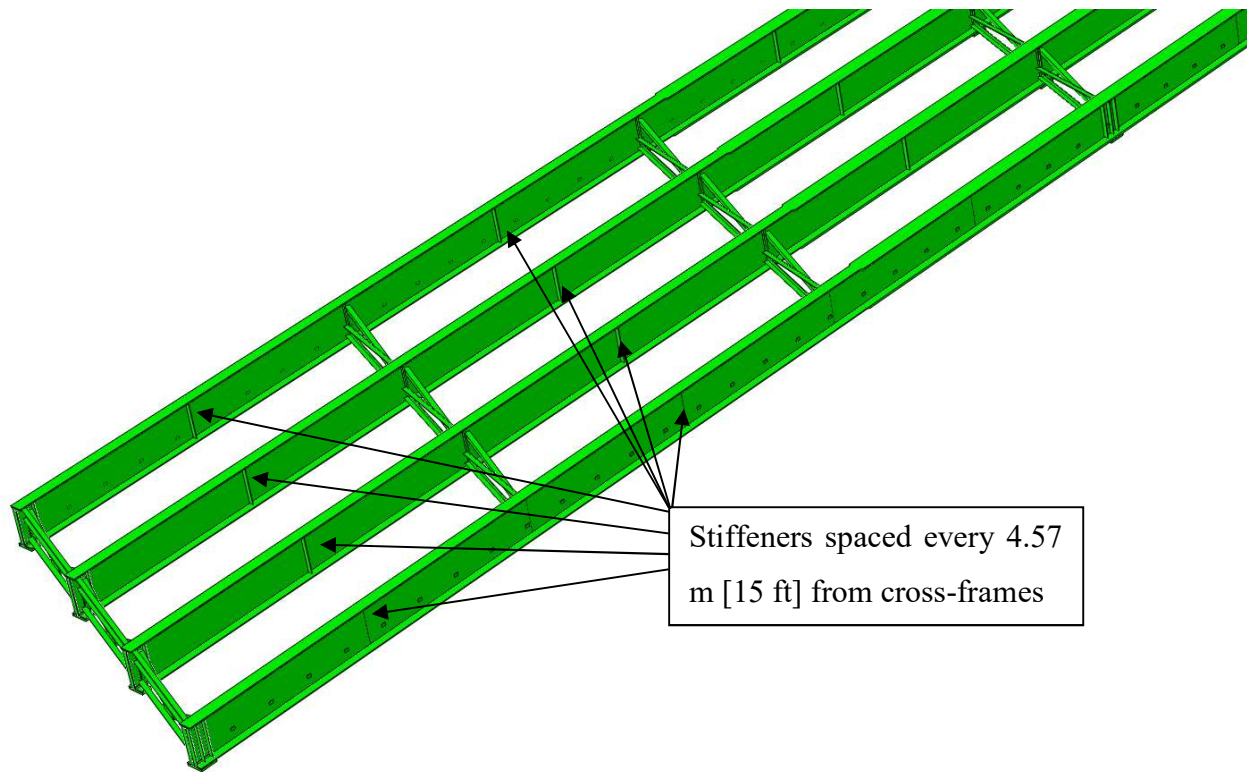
Stiffener placement in bridges with 9.14 m [30 ft] cross-frame spacing
